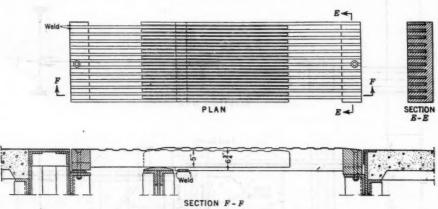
DETAIL OF GRATING, CENTER SPAN.
